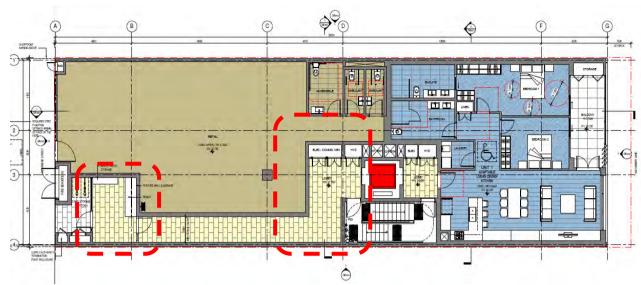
Proposed amended commercial floor space showing residential plant room and ground floor lift lobby areas not included in original approved ground floor plan.
